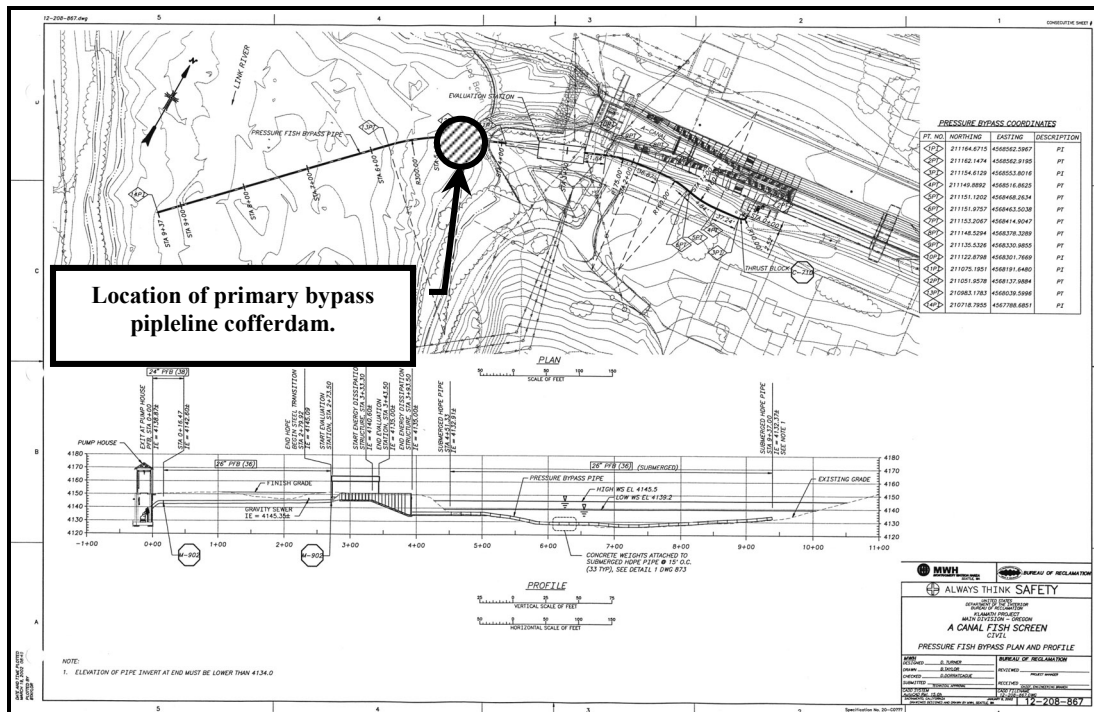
Pressure Fish Bypass Plan and Profile and pipeline cofferdam.
